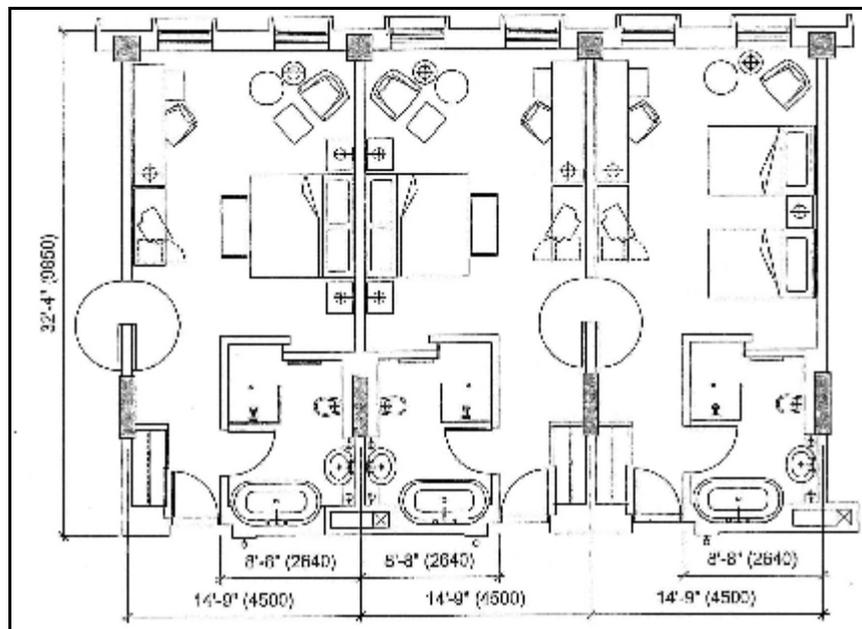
An example of standard suite rooms. (MCGOWAN and KRUSE, 2004, 378).
